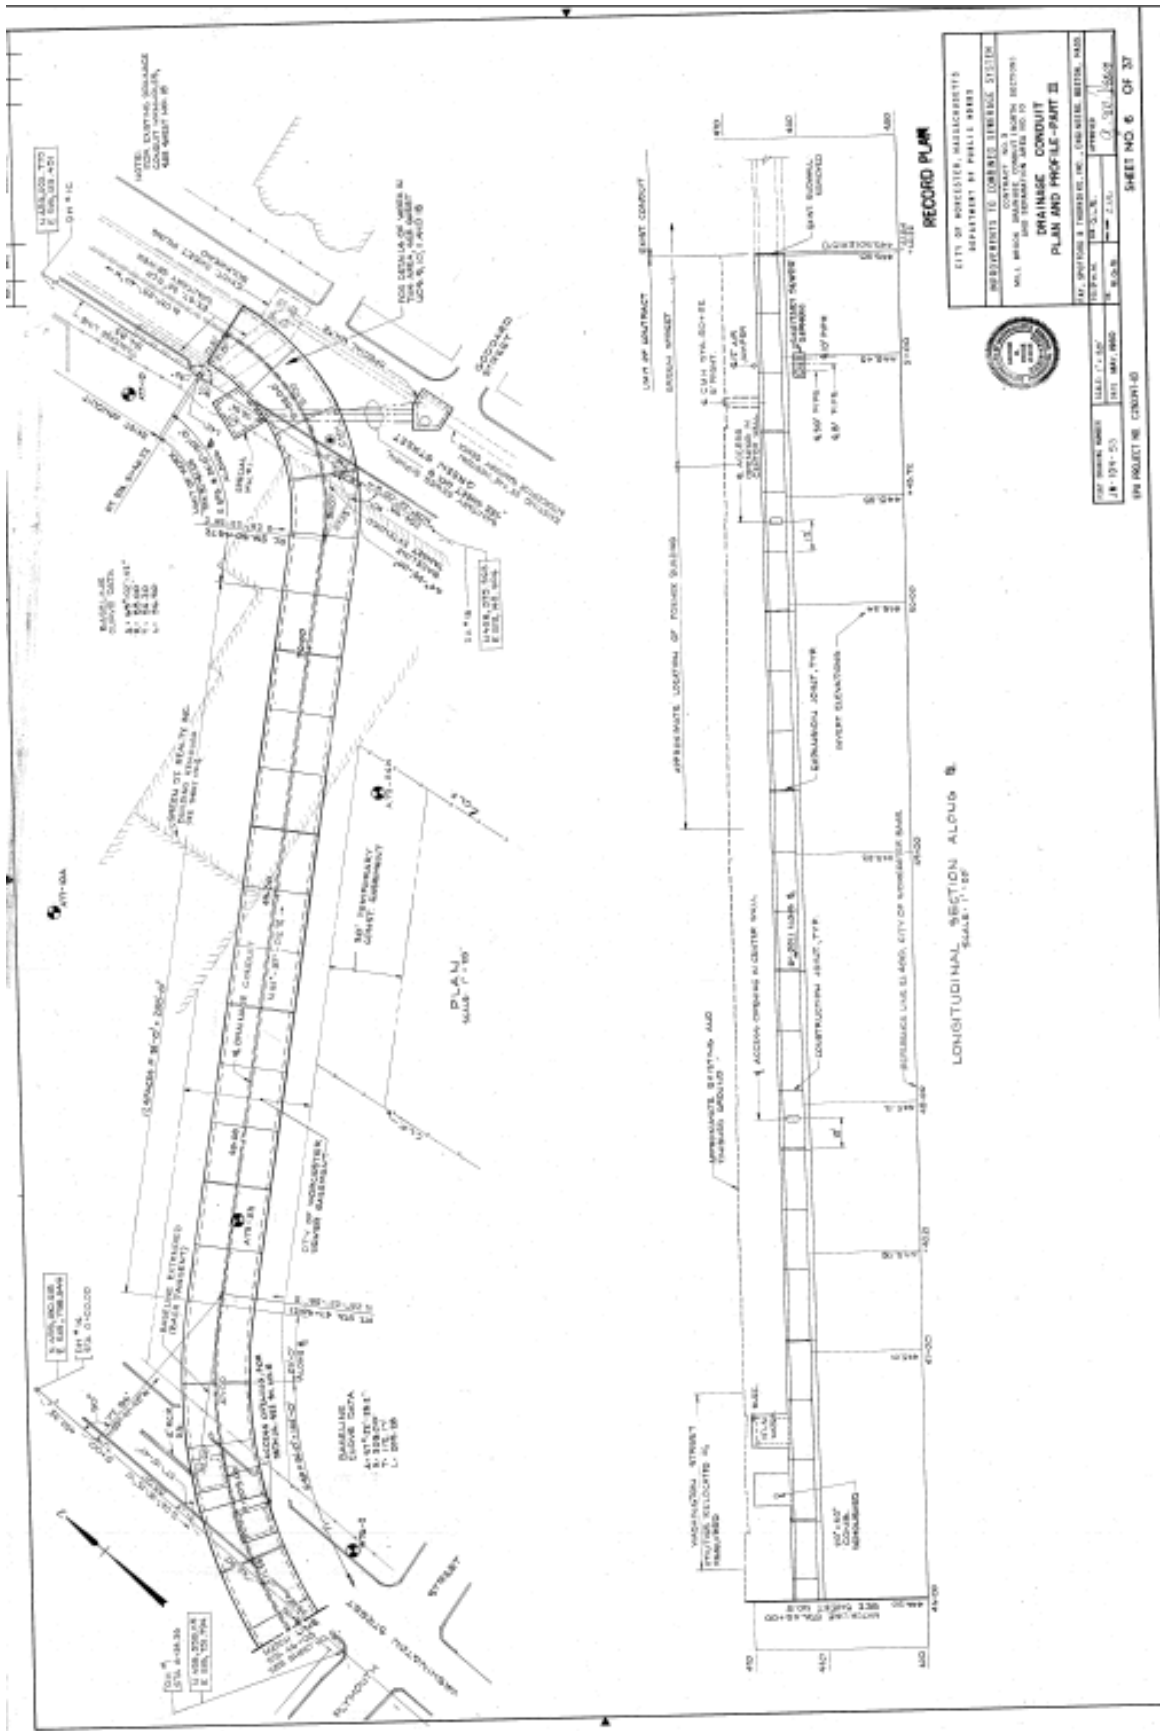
Improvements to Combined Sewerage System Contract No. 3 - Drainage Conduit Profile Part II
